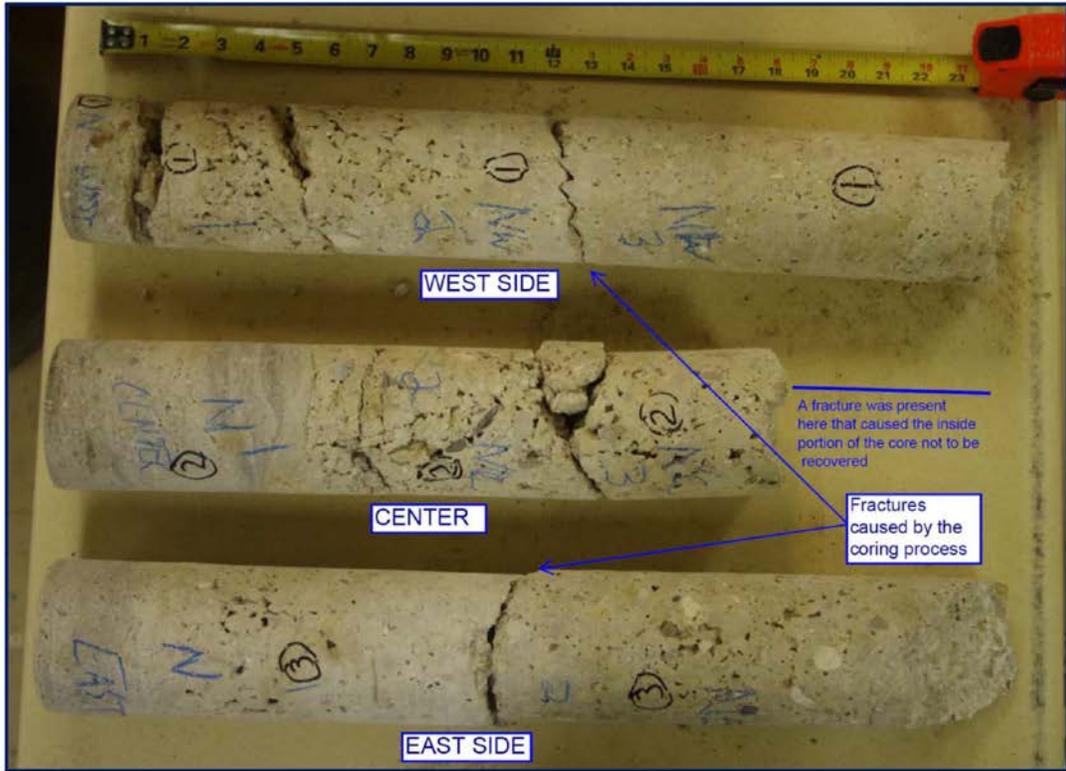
CONCRETE CORE PHOTOGRAPHS
